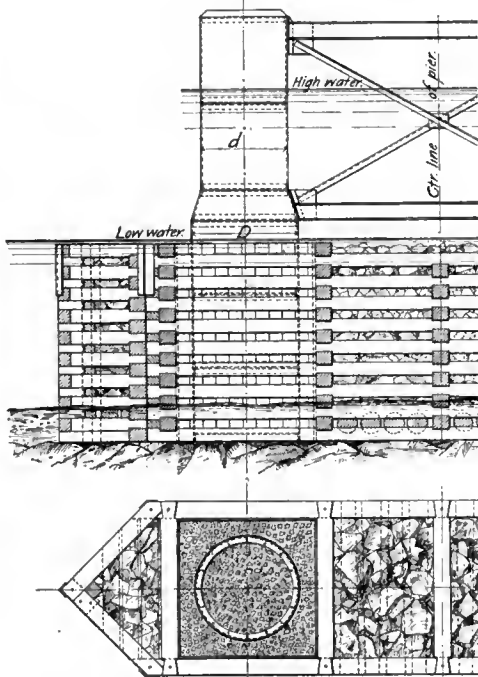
CYLINDER PIER ON ROCK, WITH CRIB PROTECTION.
